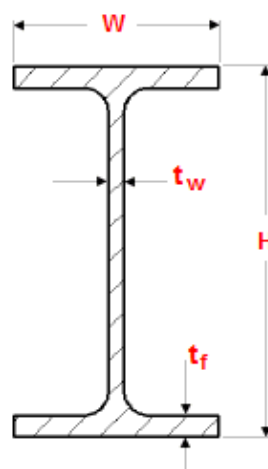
Schematic sketch of I-beam dimensions [69]
